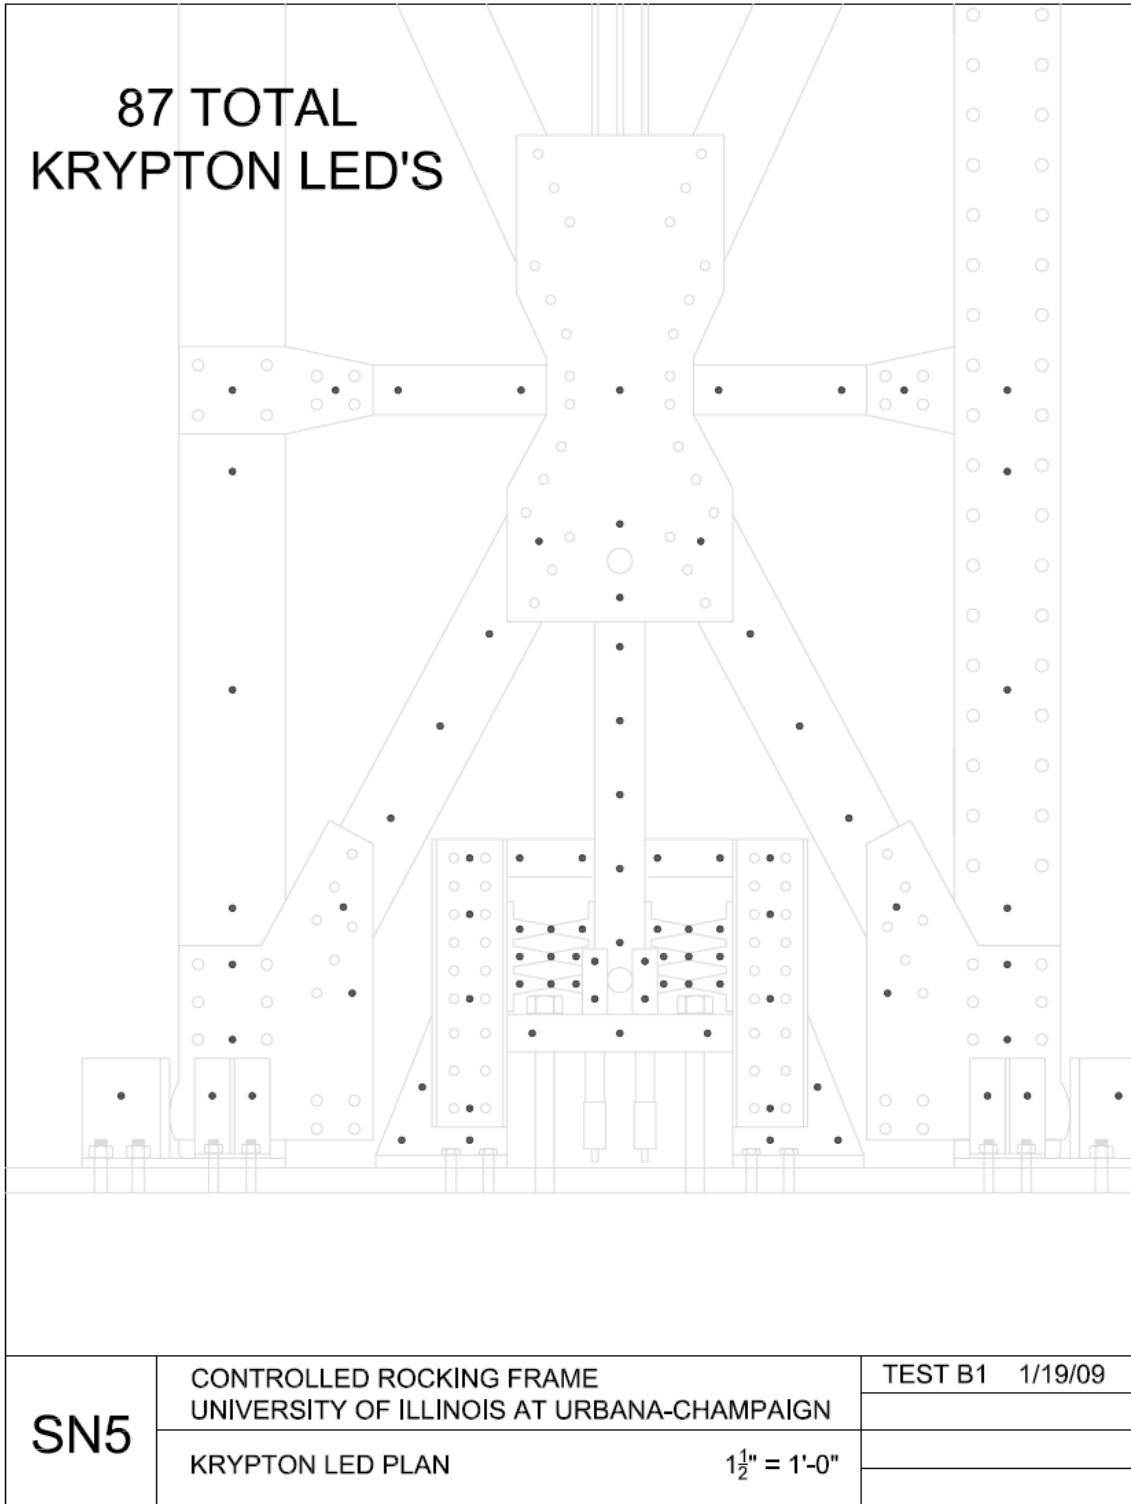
Single Frame Configuration Instrumentation Plan Drawing – Krypton LED's
